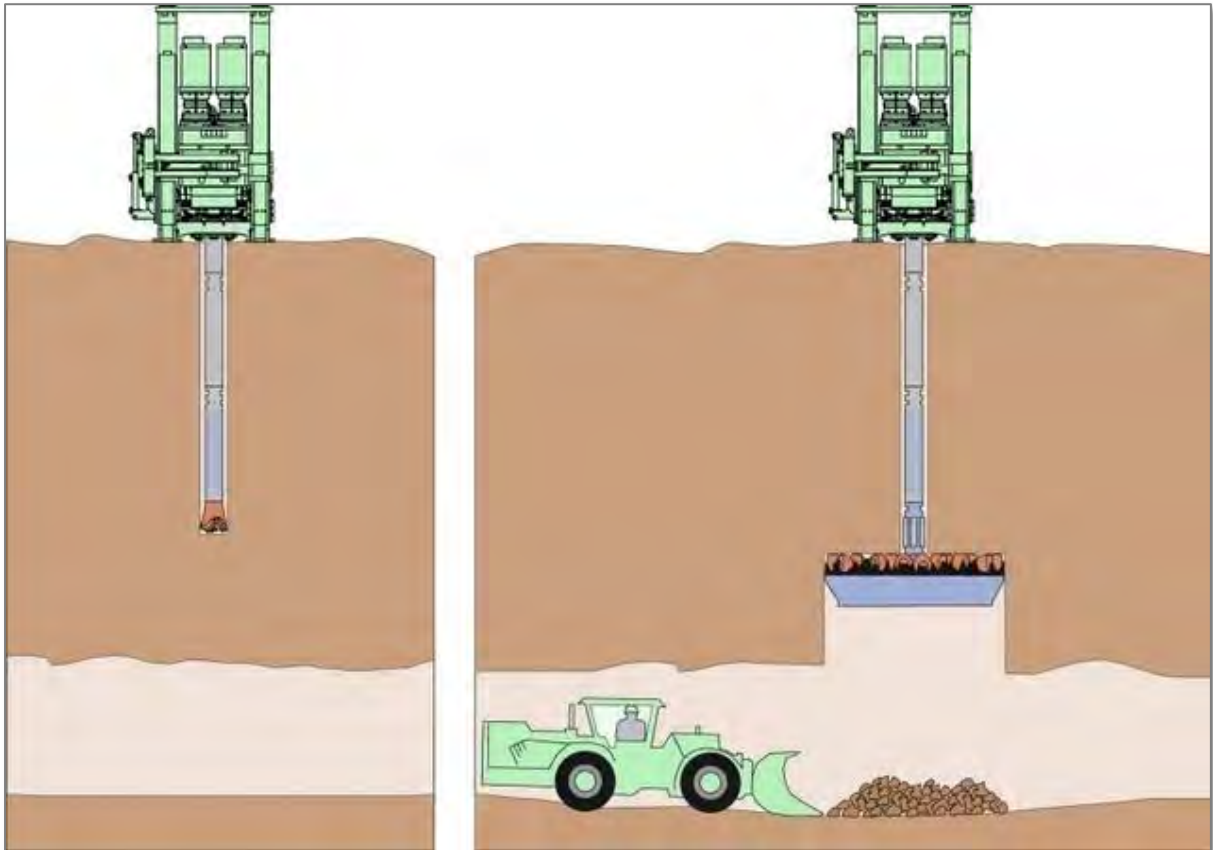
| PROPOSED CONSTRUCTION METHOD OF VENTILATION RAISES AND ESCAPE WAY RAISE USING RAISE DRILLING METHODS (TUNNEL SWISS POWER, 2017)
